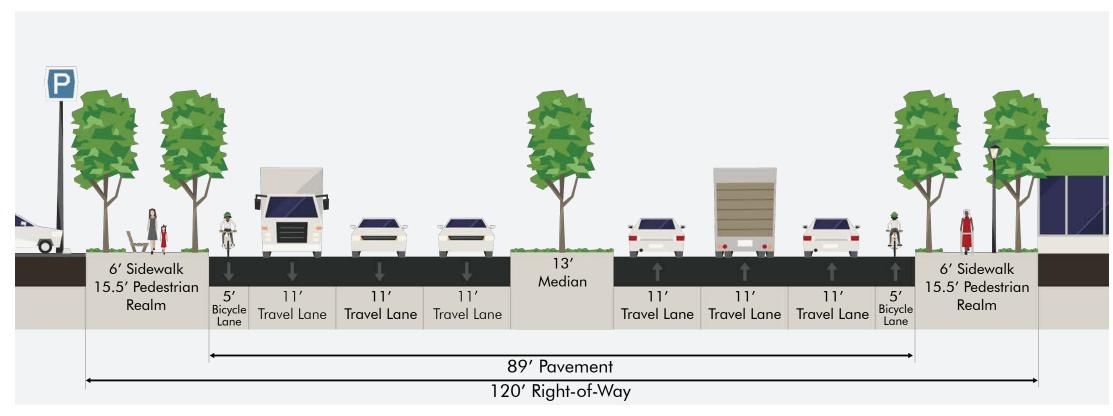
Proposed Typical Cross-section - Roark Road to Dove Country Drive
